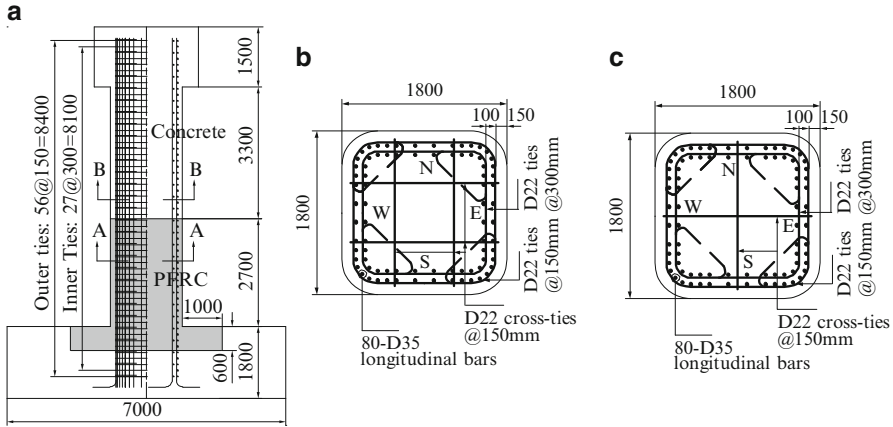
C1-6 column configuration and details (a) Reinforcement detail (b) Section A-A (c) Section B-B
